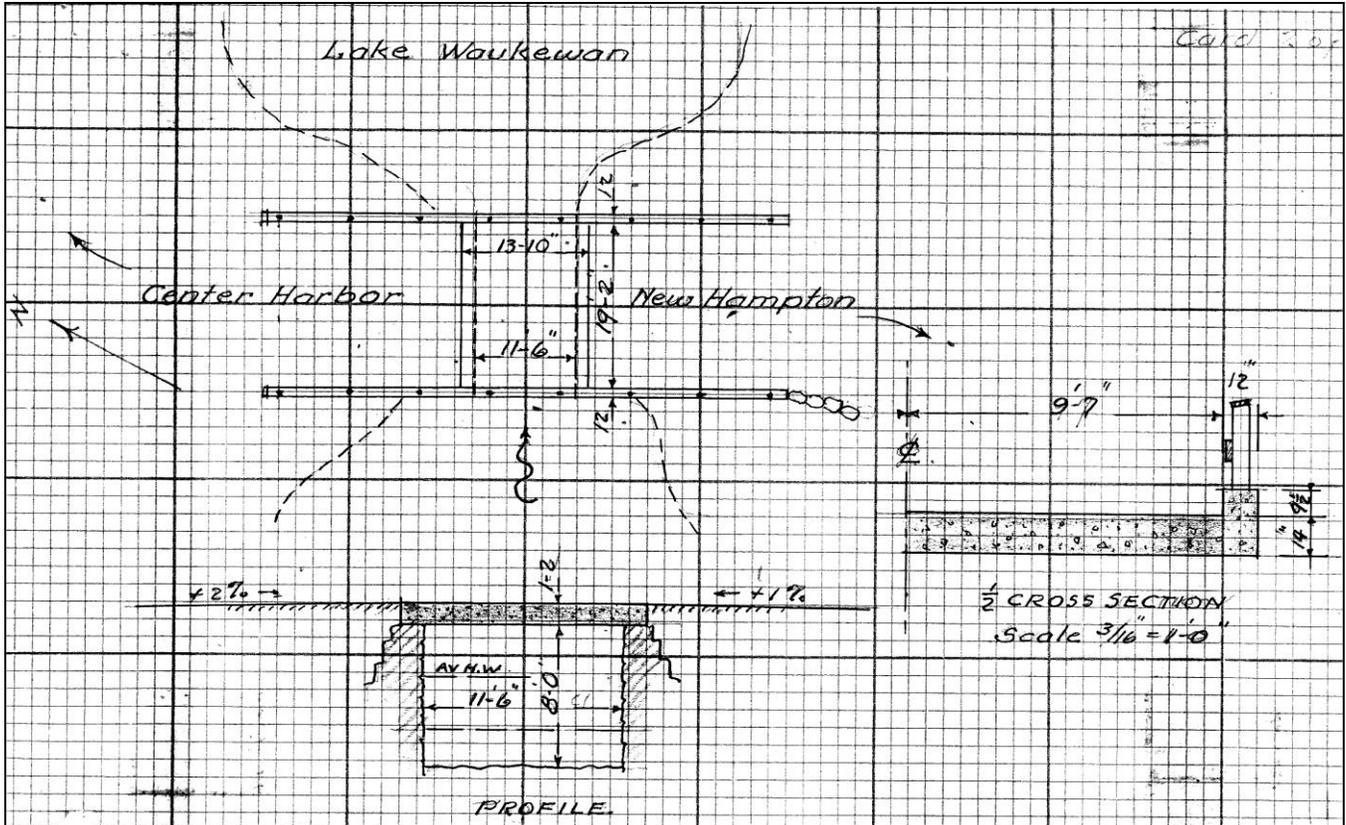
Plan, elevation and section sketches from Bridge Card (NHHD Bridge Card 1941).
